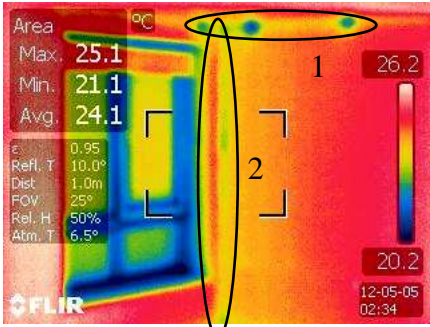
Internal infrared image of the house first floor triangular bay area dwelling 3
